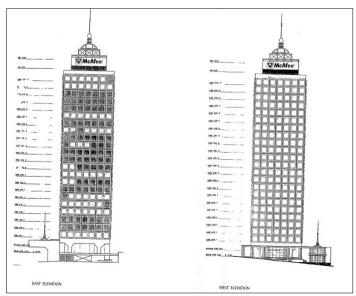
Approved McAfee signage on West (Front) elevation and East (rear) elevation
